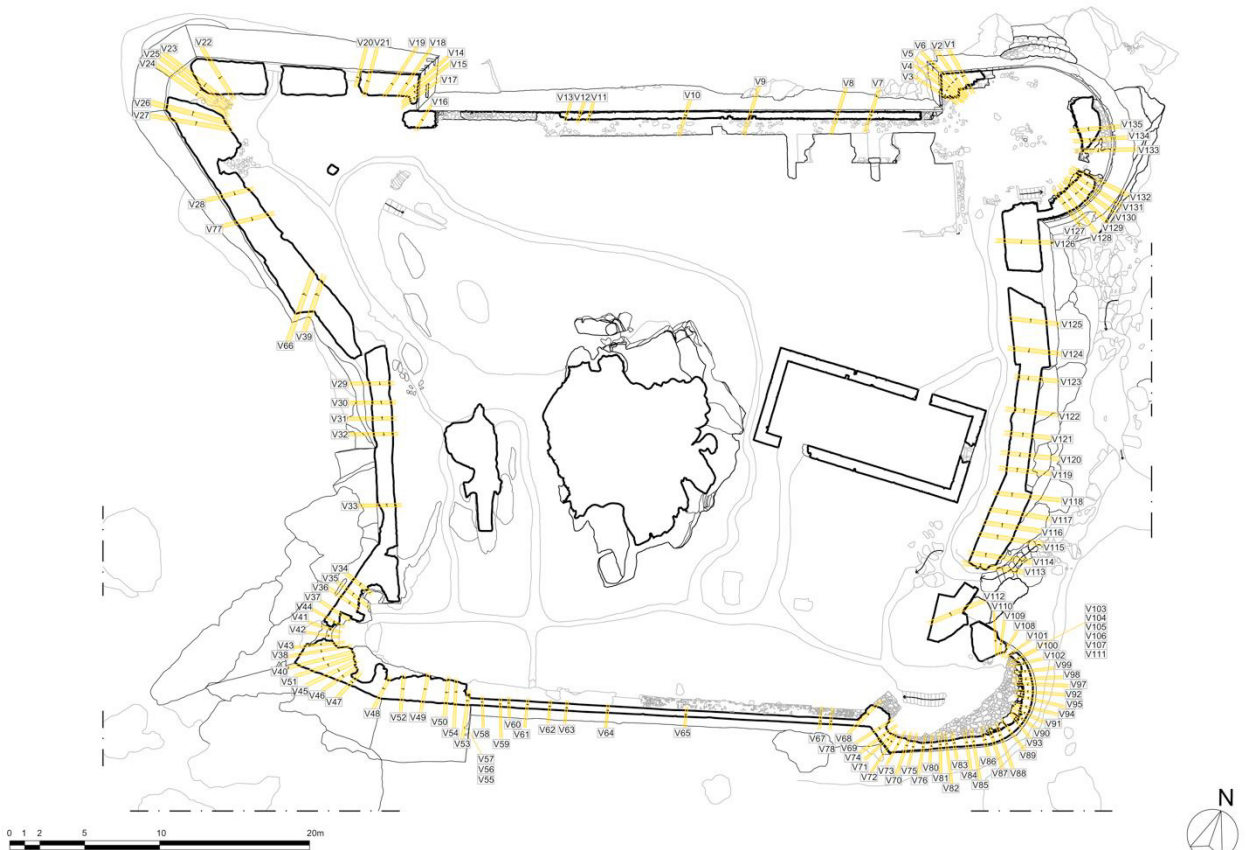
Plan of the fortress with the drawing of the structural cracks on the walls.
